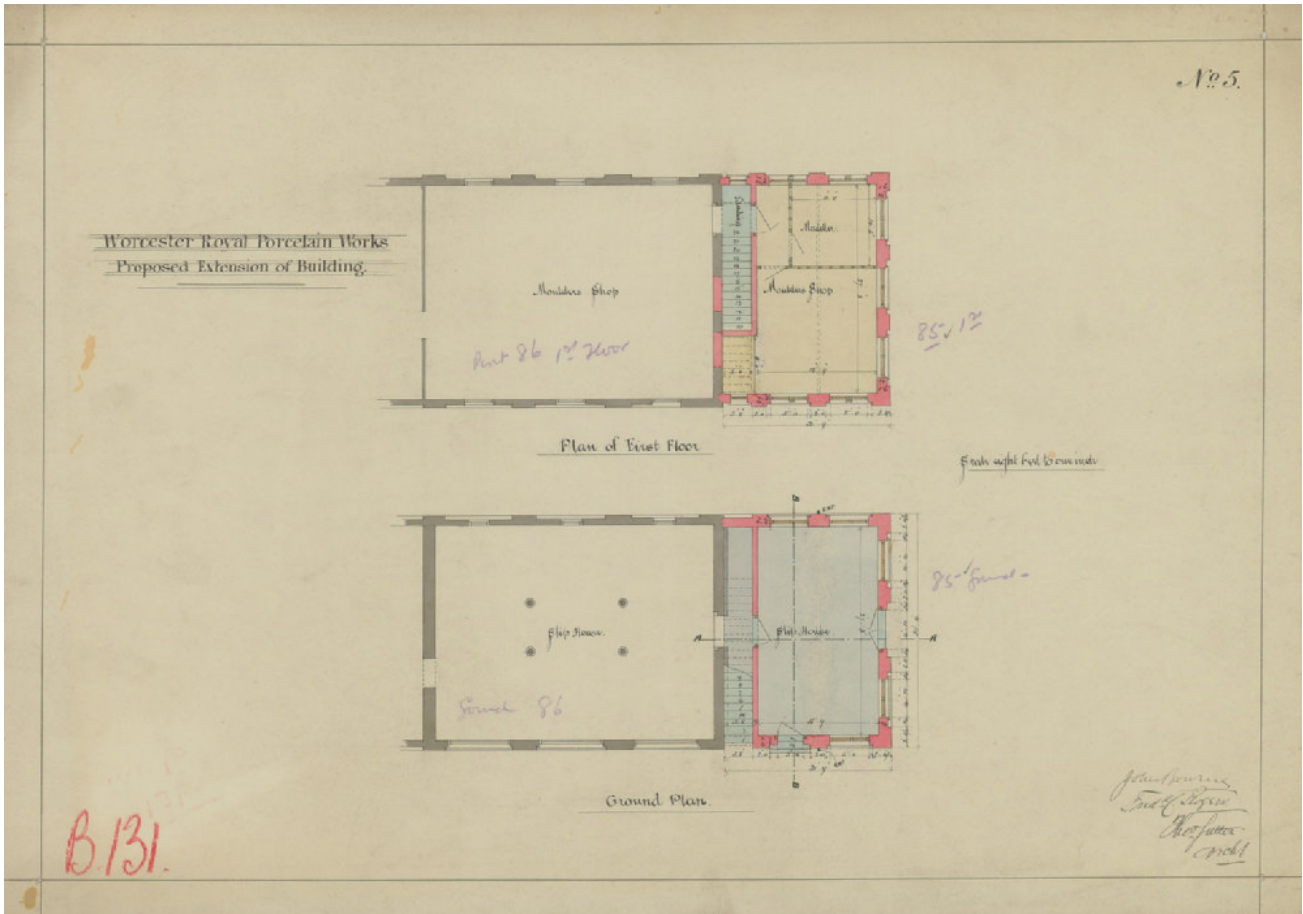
Building A (left) and Building B (right) by Thomas Sutton as planned in 1888 (source: W25.22 1888 Worcester Porcelain Museum)
